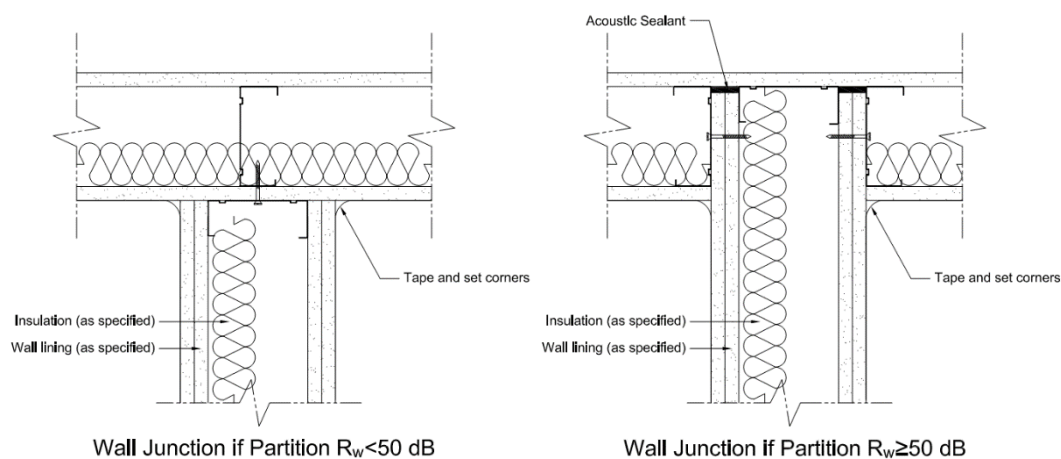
Wall / partition junction detail to minimise flanking path via walls.
